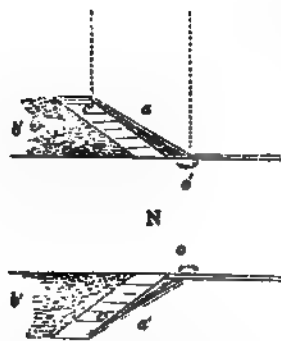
Represents an elevation M and plan N of a portion of a single arch bridge with straight wing-walls sustaining an embankment across the valley of the water-course.
